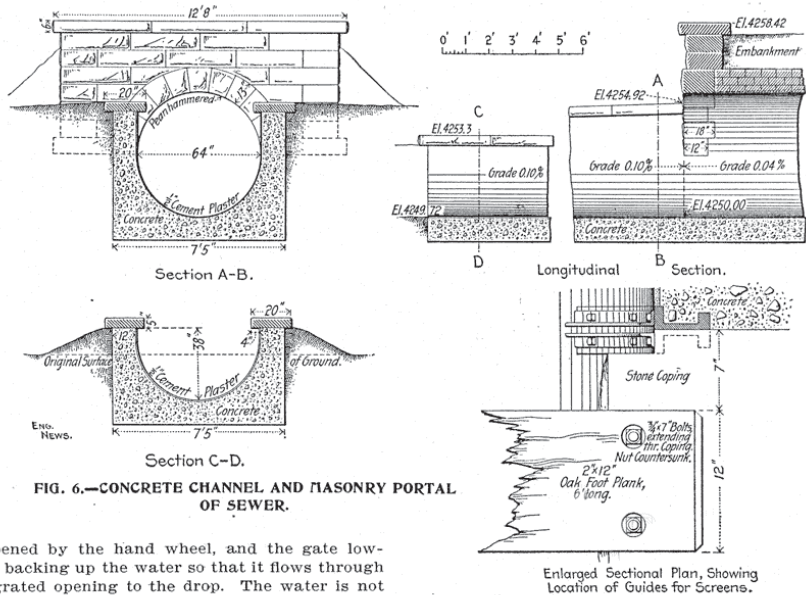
CONCRETE CHANNEL AND MASONRY PORTAL OF SEWER.
